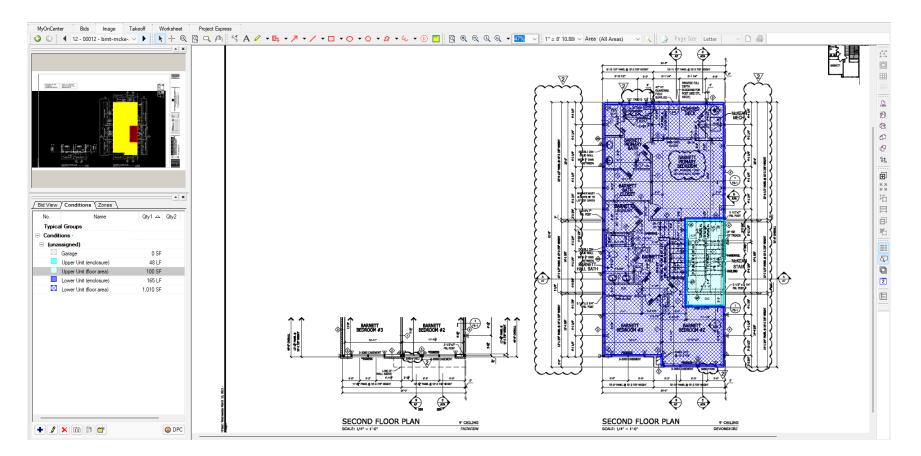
Site-built test unit floor plans, level 2 (project 3)
